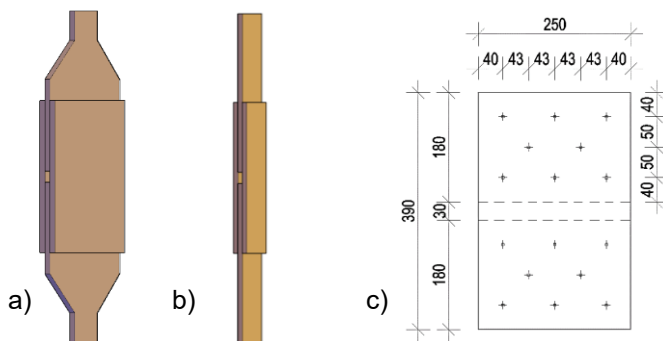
Specimen for a) metal fasteners b) glued connections. c) Disposition metal fasteners (in mm)
